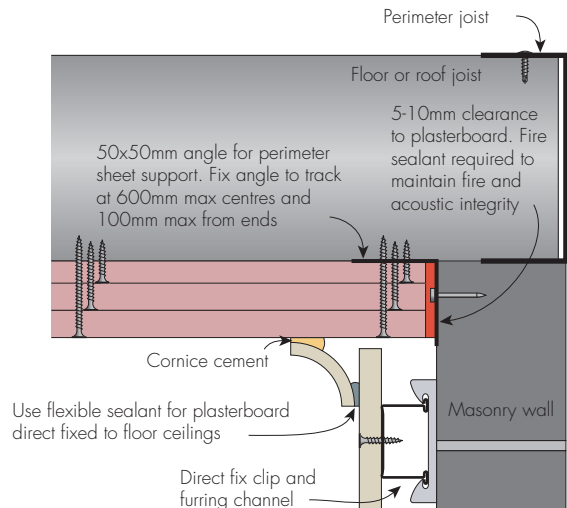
Fire Rated Ceiling to Masonry Wall
